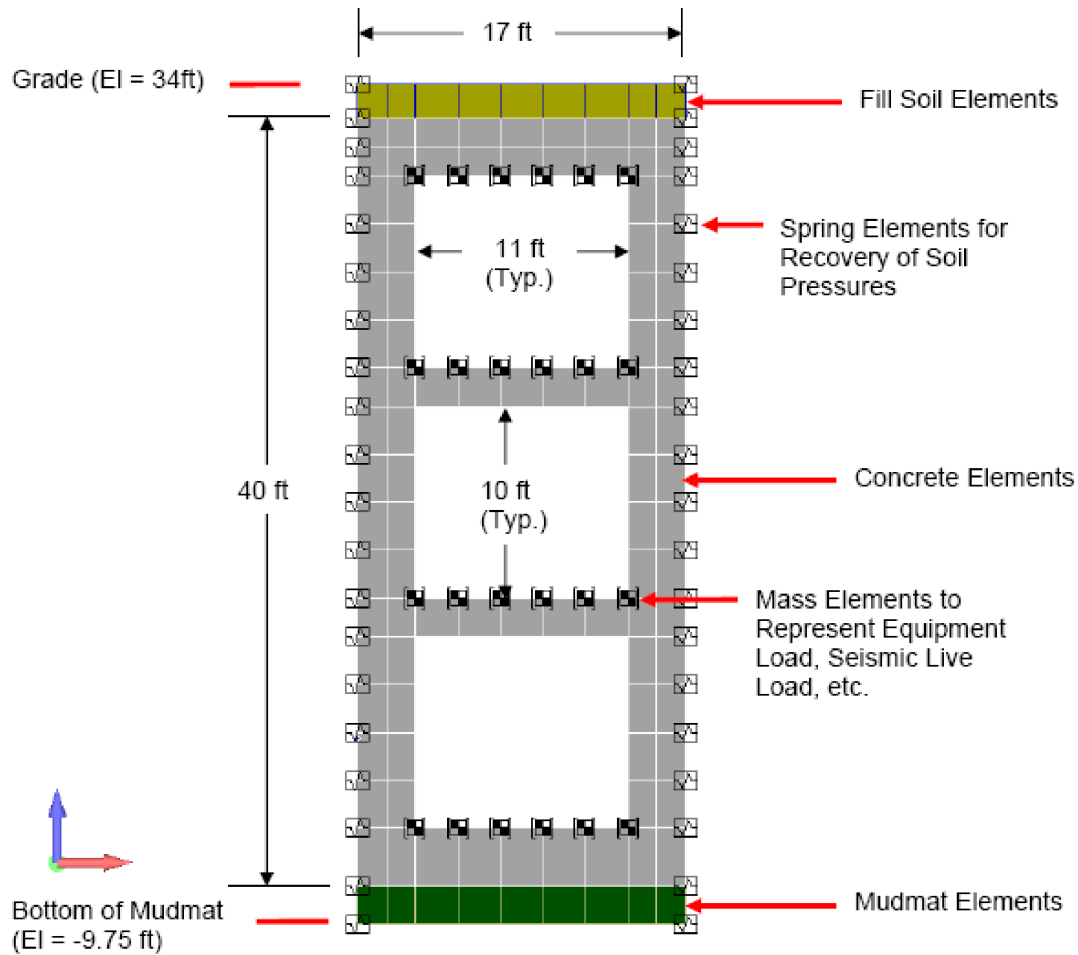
H.6-209 SSI Model of RSW Piping Tunnel
